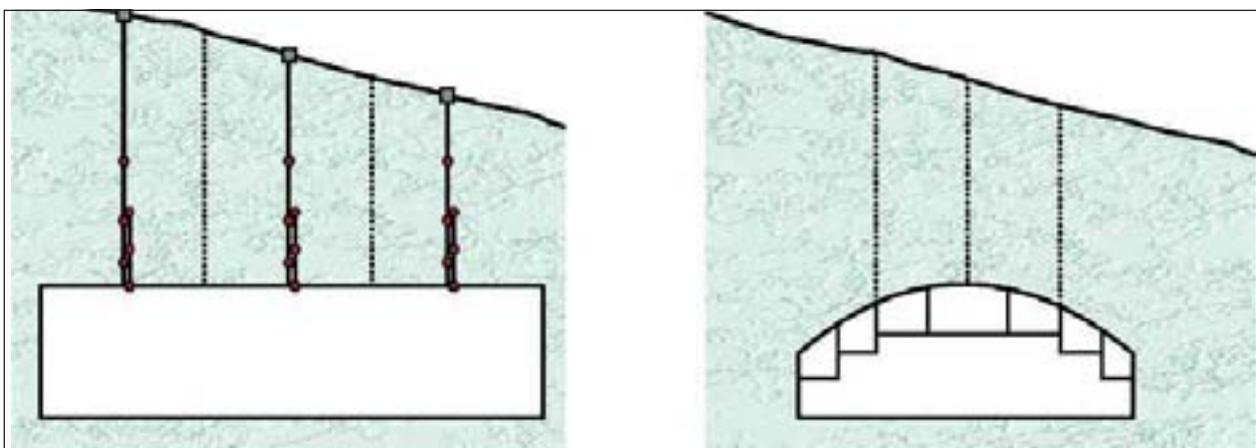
Longitudinal section and cross section that show examples of the placing of the instrumentation during the blasting of a large cavern; span=60m, length=90m
